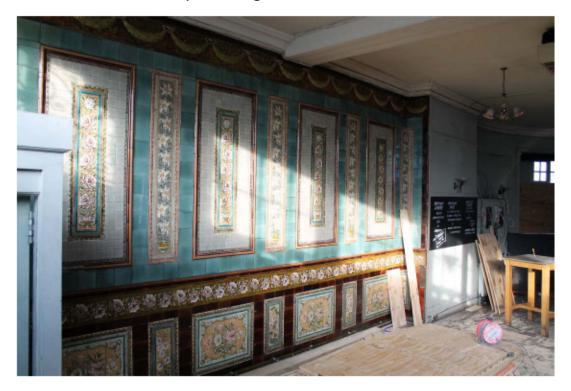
Ornate ceramic tile wall in the Walpole bar area, looking north-west
